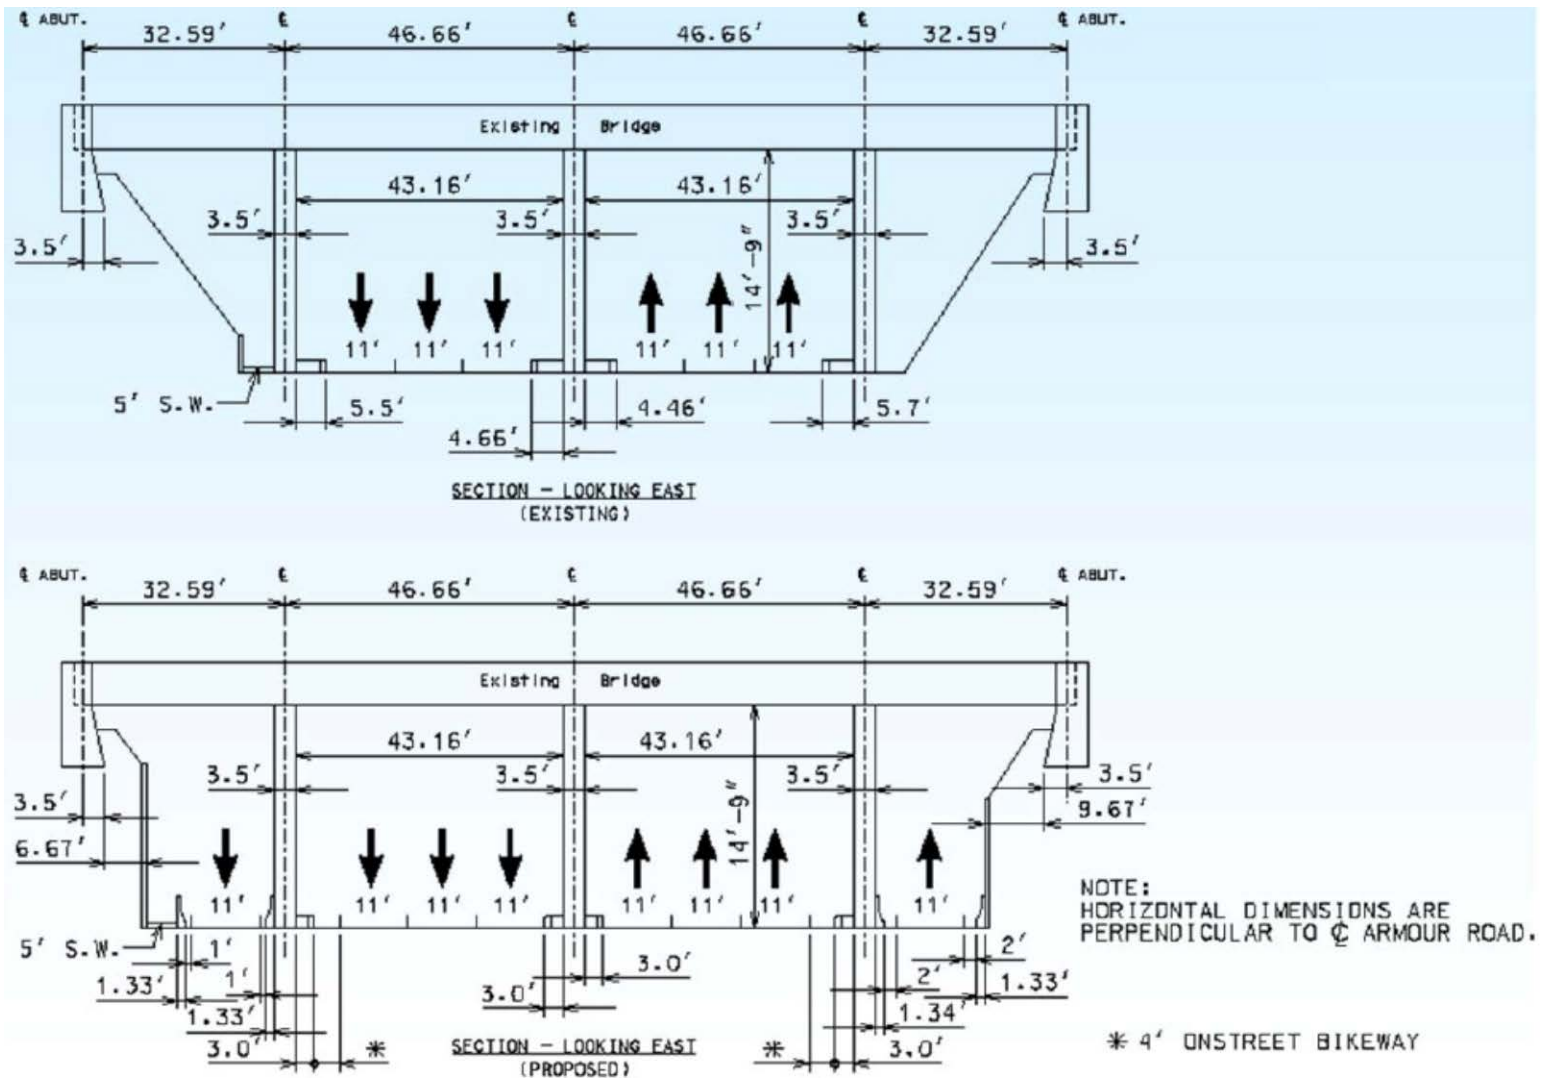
Typical section of Armour Road under existing bridge on I-29/35.
